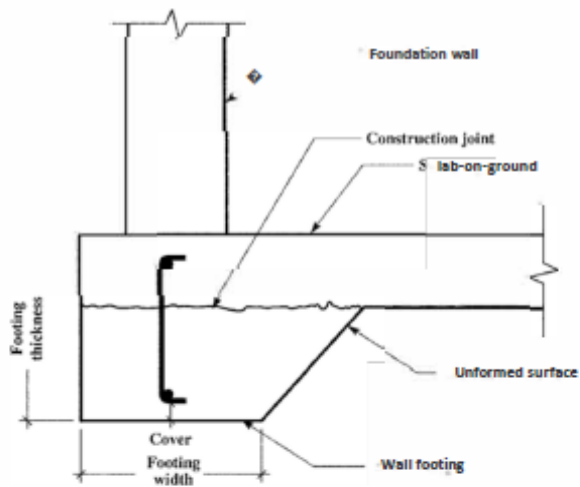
Thickened slab footing with horizontal construction joint.
